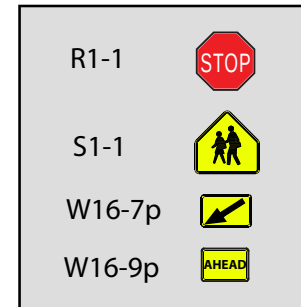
Recommendation 2 - Add Crosswalk and Construct Ramps on Webster Street and Elder Road
